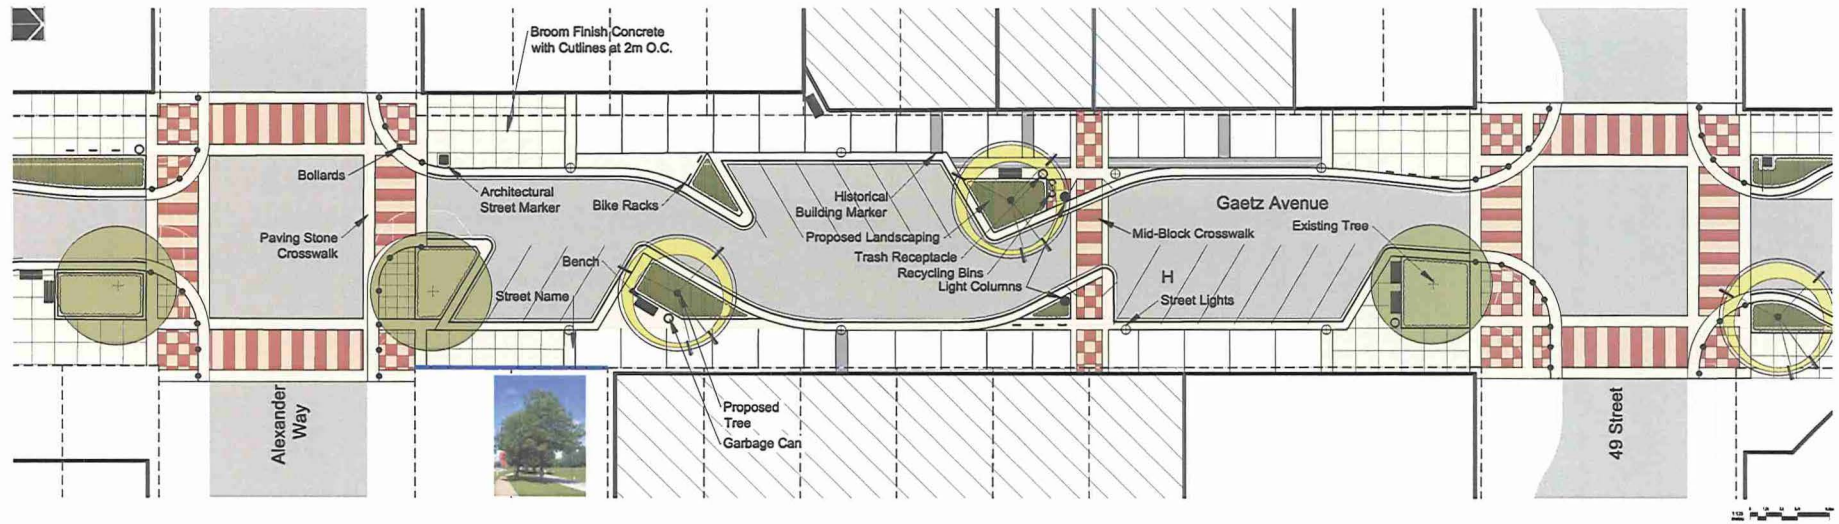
7 illustrate the final streetscape design that has been prepared. Figure 8 shows cross-sections and proposed features.
